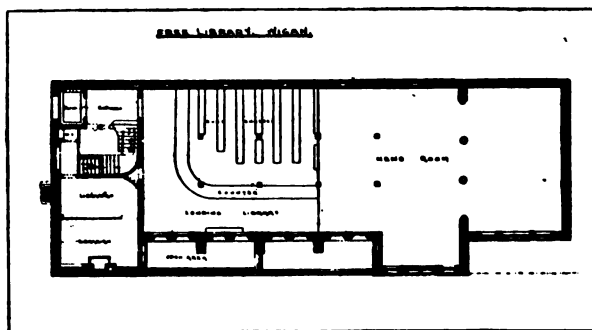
Plan of the ground floor of the Wigan Public Library.
